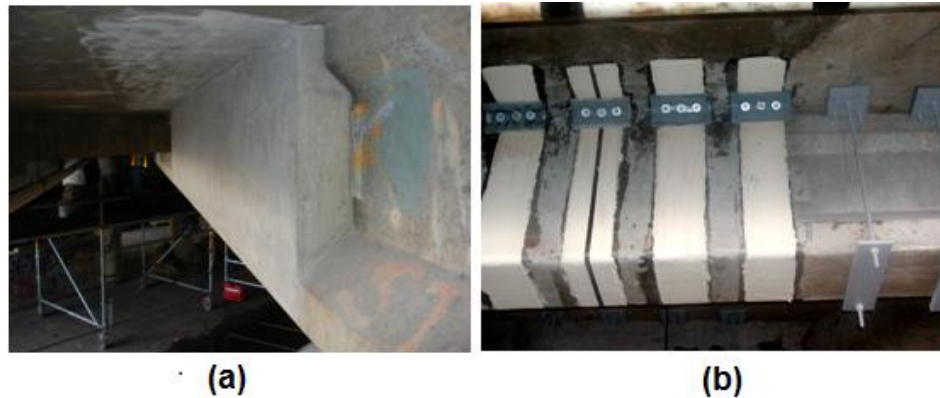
(a) Concrete infill of the AASHTO Type-II girders for the CFRP application, and (b) the completed CFRP stirrups[32].
